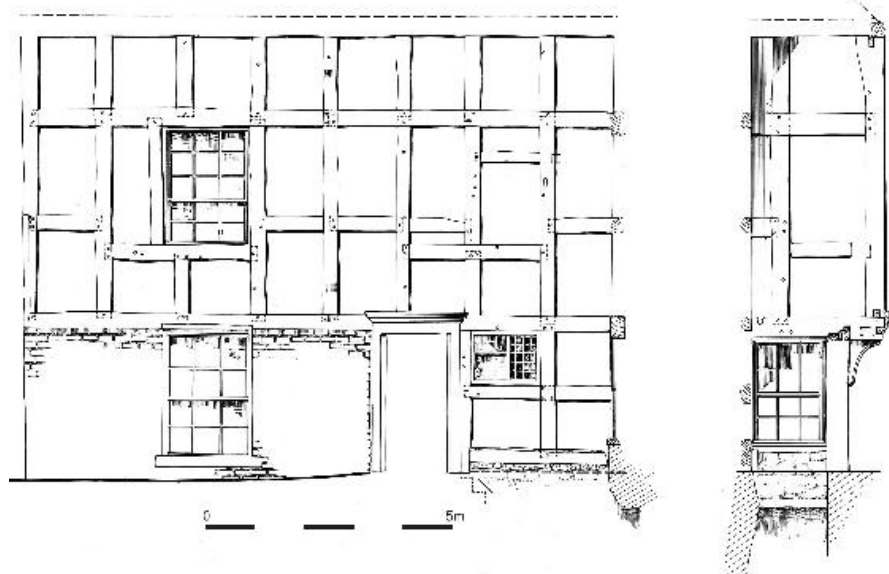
Elevation of the northern side frame of the rearmost range of 14 Church Street; there are indications of two large primary window openings on the first floor, subsequently altered; the ground floor has been more radically altered
